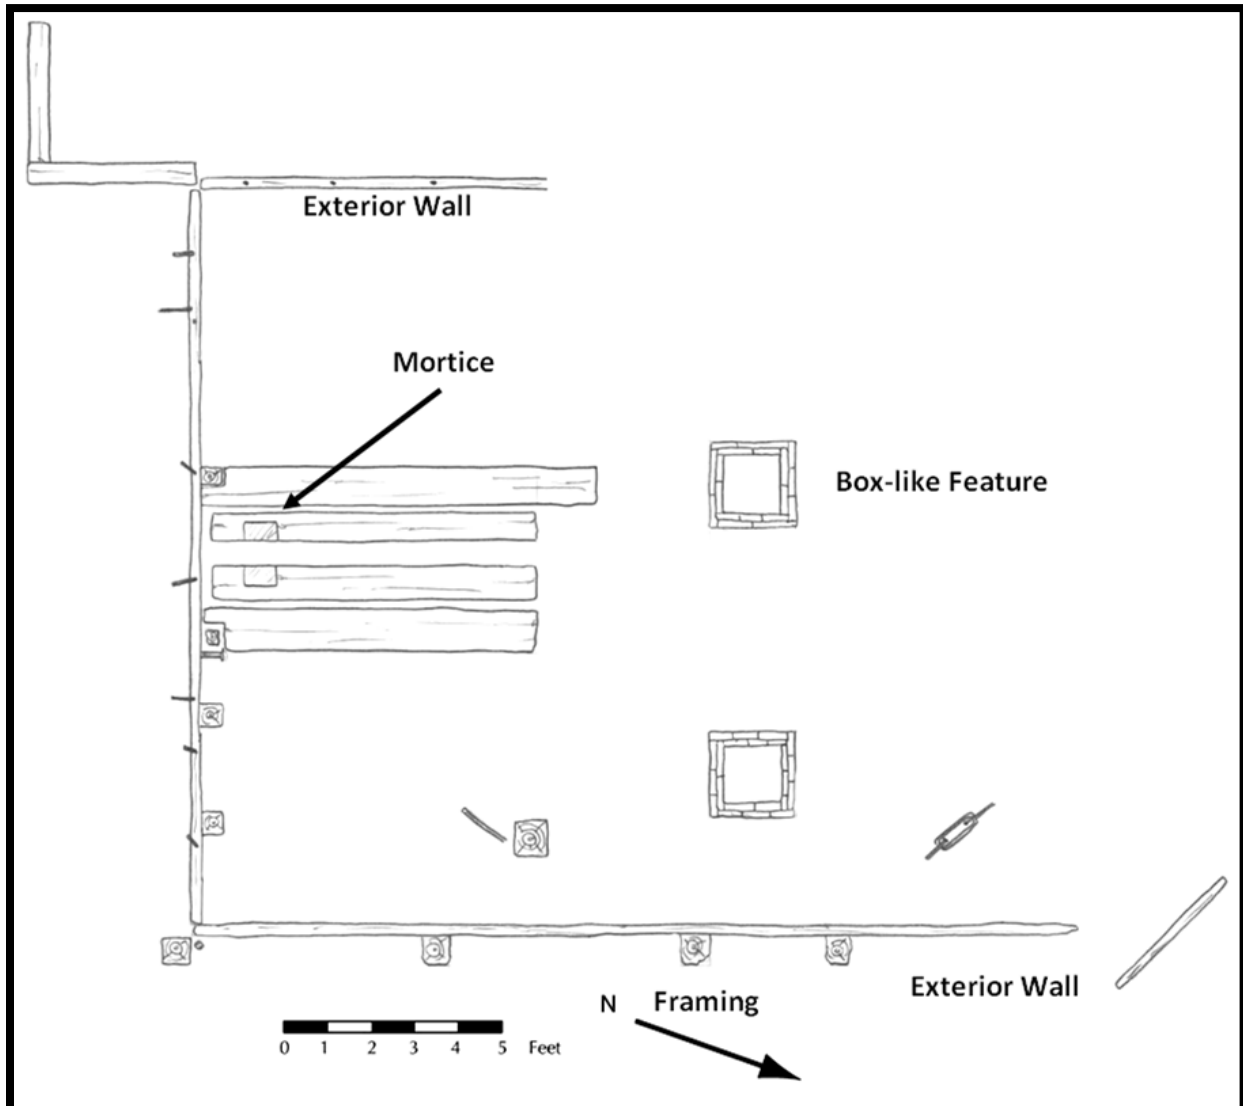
Plan view drawing of A38 (Sarah Tichonuk, LCMM Collection).
